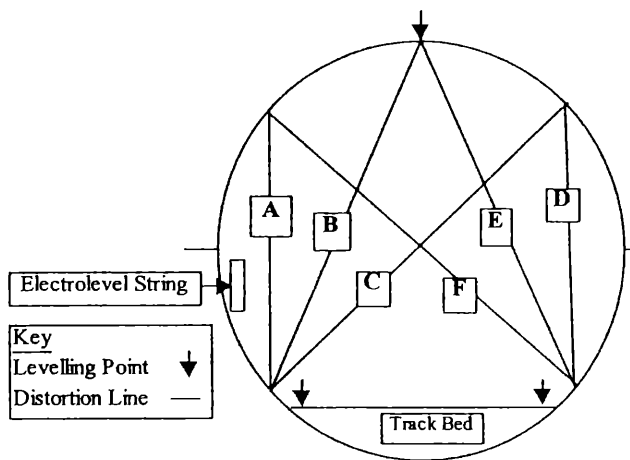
TYPICAL SECTION OF MONITORING LAYOUT IN PICCADILLY LINE TUNNEL.
